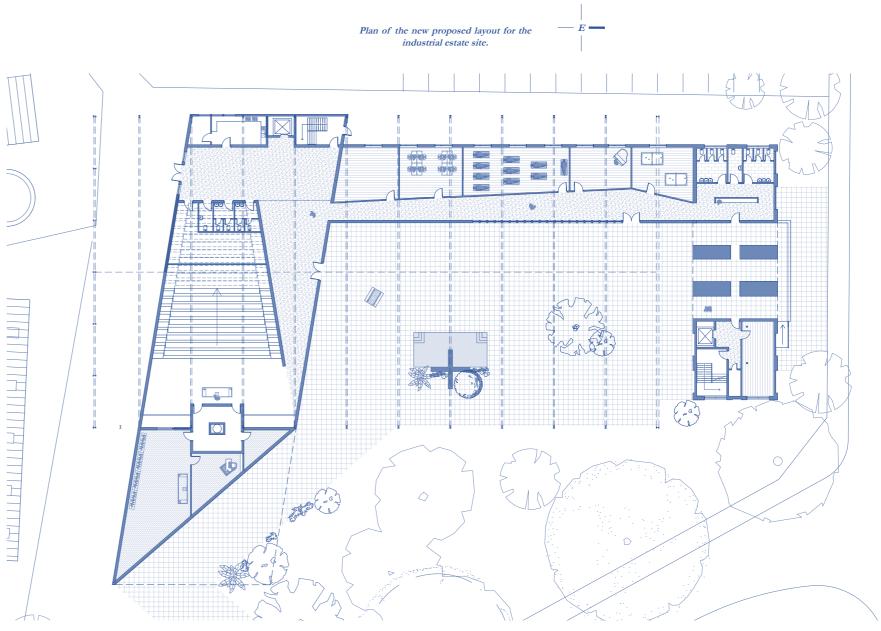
Industrial Estate Church, the site of the existing Peniel Church Dublin, Site Plan
